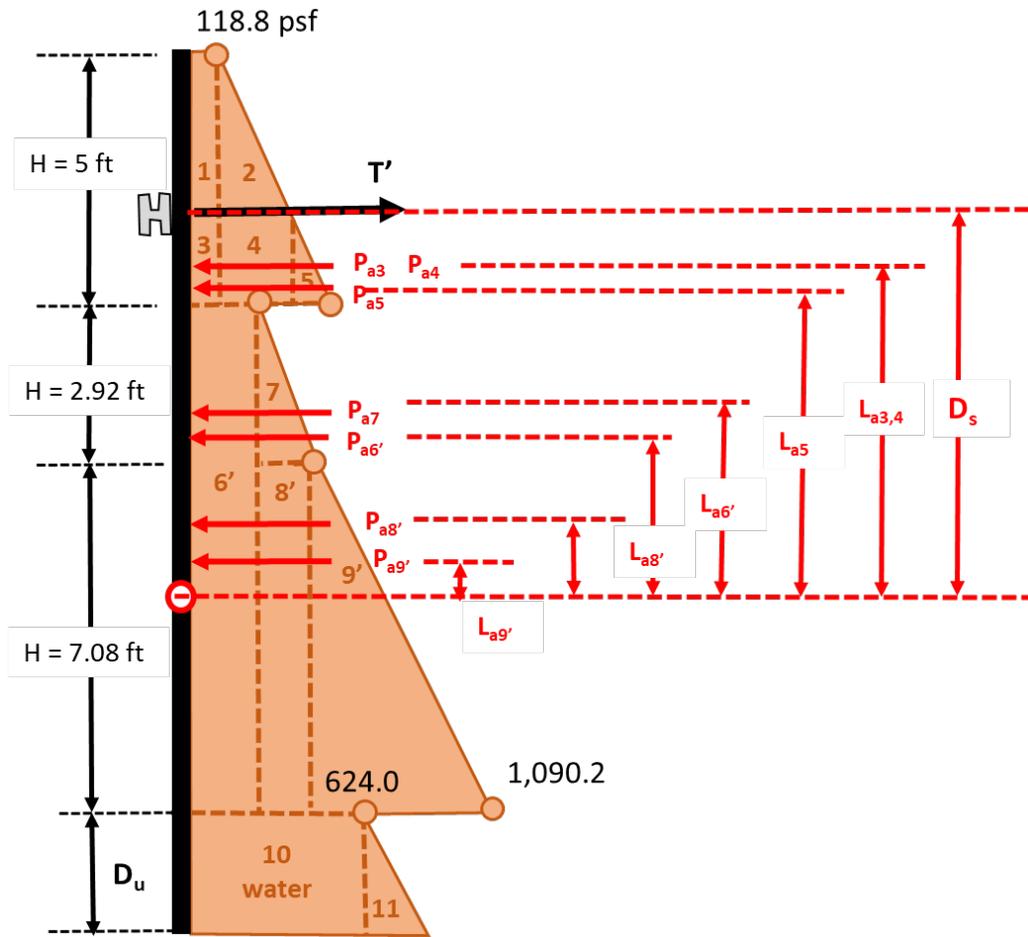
Determination of zero-shear location on sheet pile wall.
